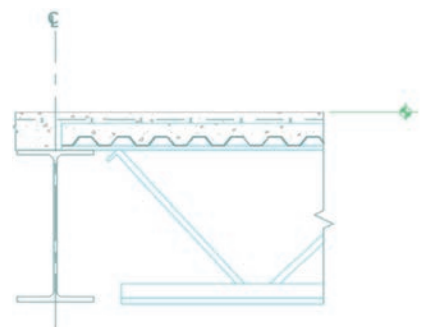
Typical Vescom Joist to Wide-flange Beam Connection
